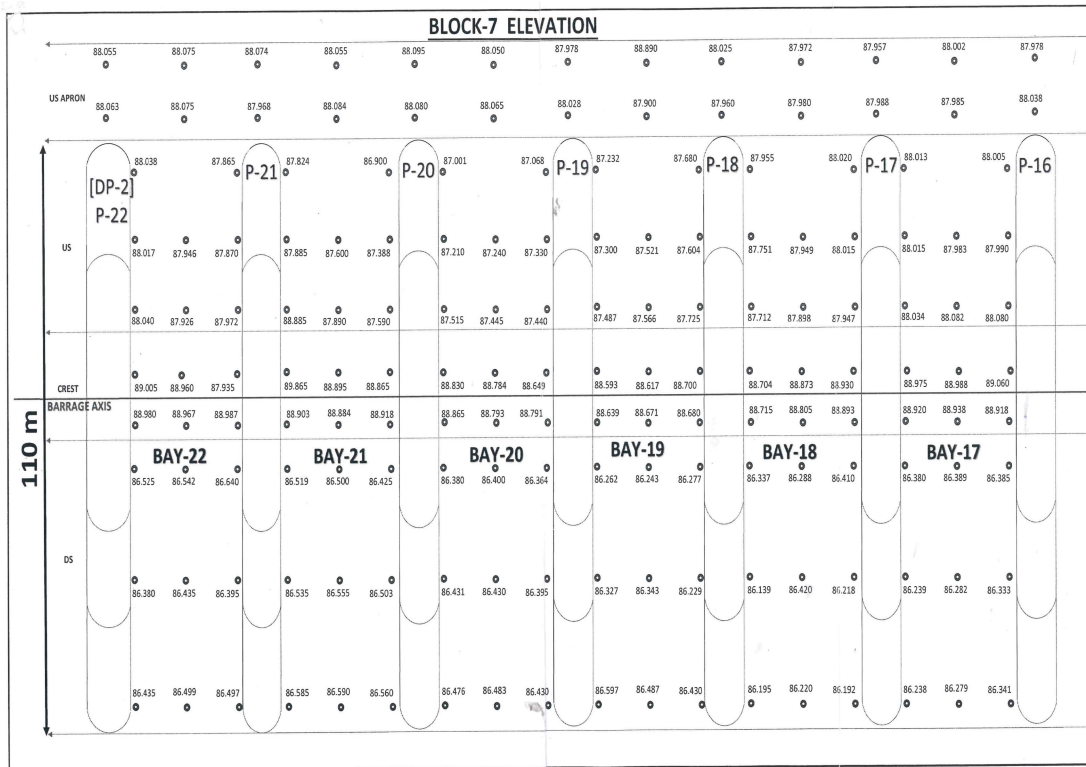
Longitudinal sectional details of Medigadda (Laxmi) barrage
